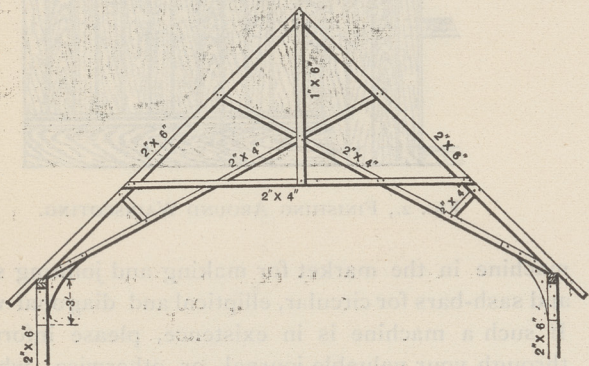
, CHURCH, ROOF SECOND DESIGN.
